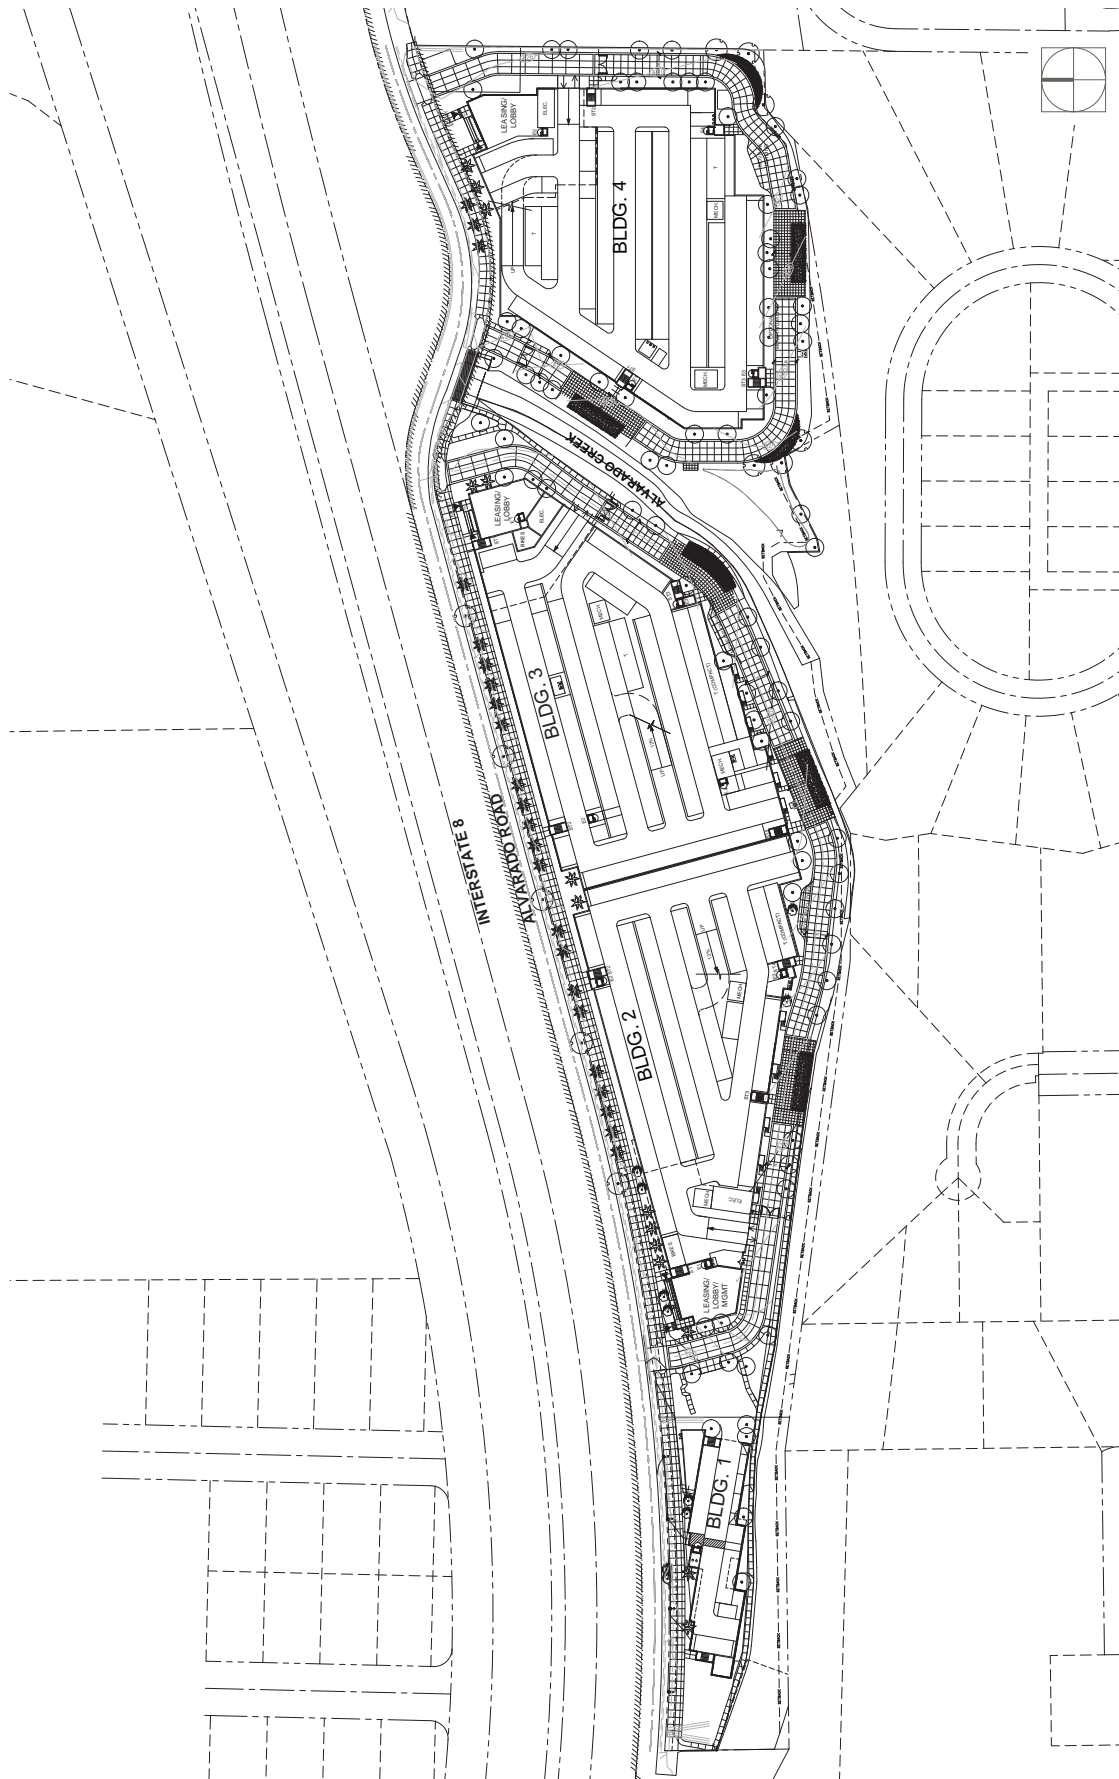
Form-Based Development Standards Typical Building Plan View at Ground Floor
